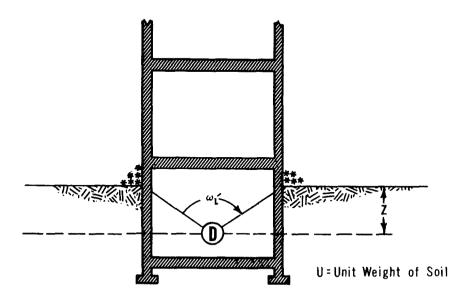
Fallout Particle Pile-up on Foundation Walls
